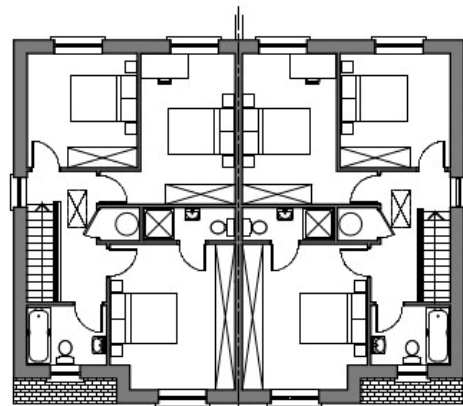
2 storey 4 bed dwelling type A (unconverted attic) to the left and 3 storey 5 bed dwelling type to the right (type A with converted attic incorporating stairs access added at first floor)
